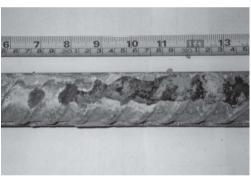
Rusting of Zinc Coating and Steel Reinforcement
